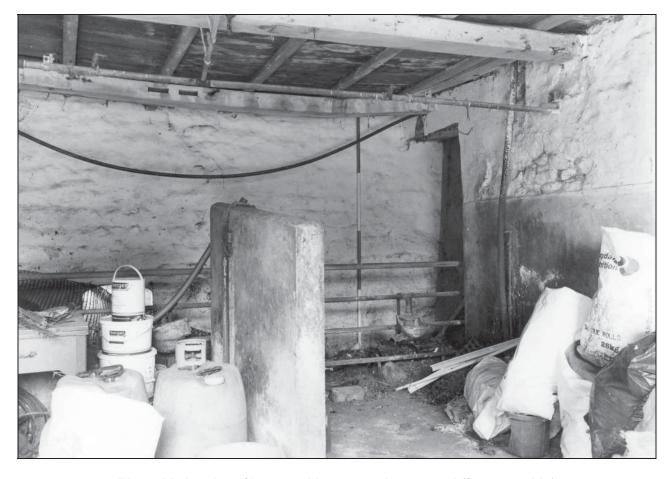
Interior of lean-to shippon, north-west end (former stable)
